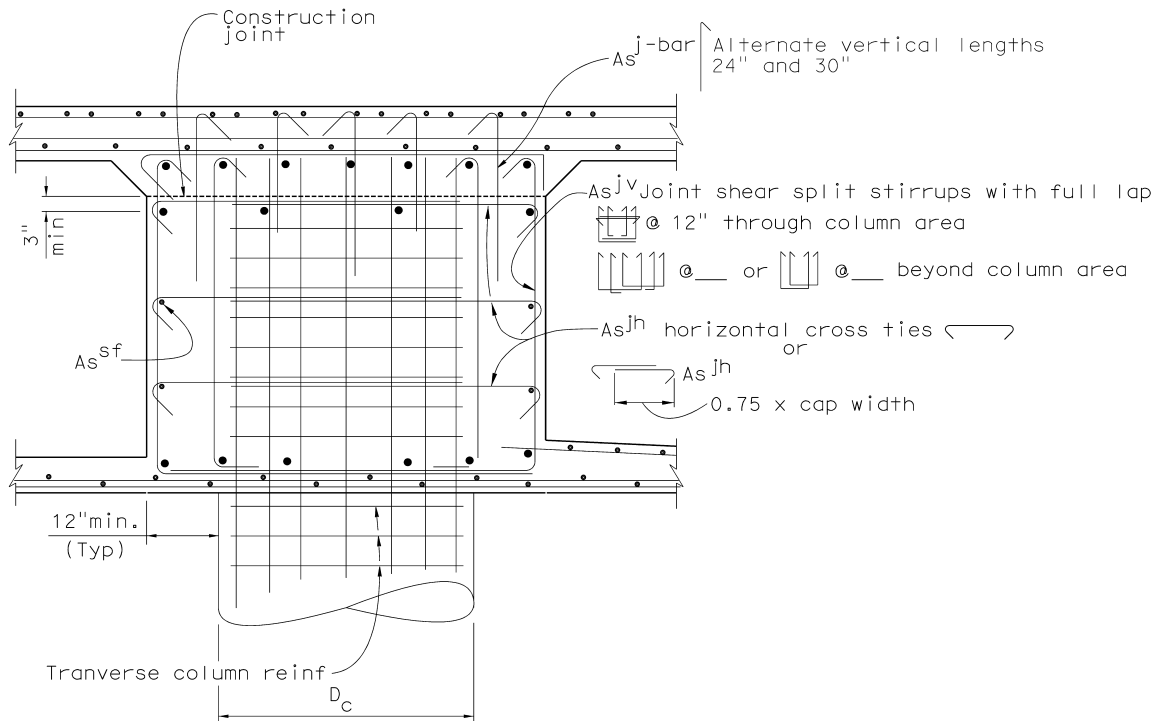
Additional Joint Shear Reinforcement for Skewed Bridges¹³
